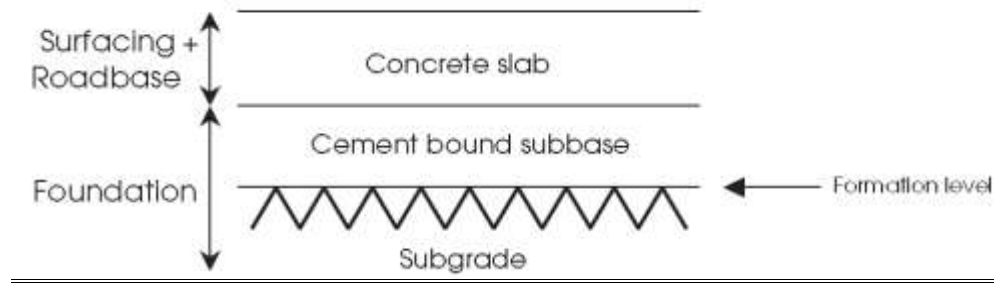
Layers within a typical rigid highway pavement. (*Pavement Design*, 2004)
